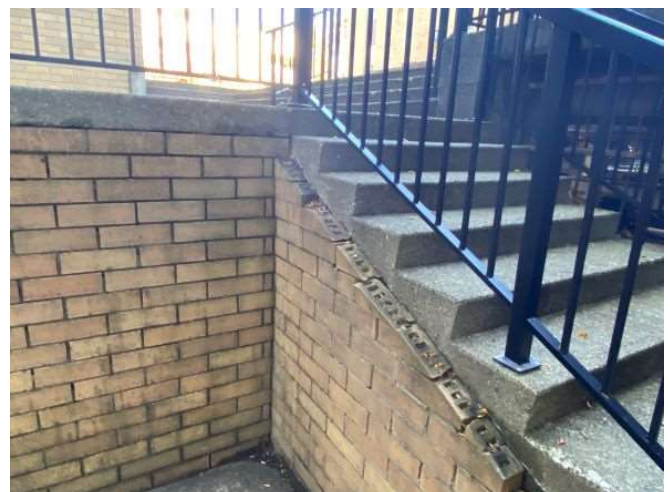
Deteriorated masonry at stairs with missing cap stone.
